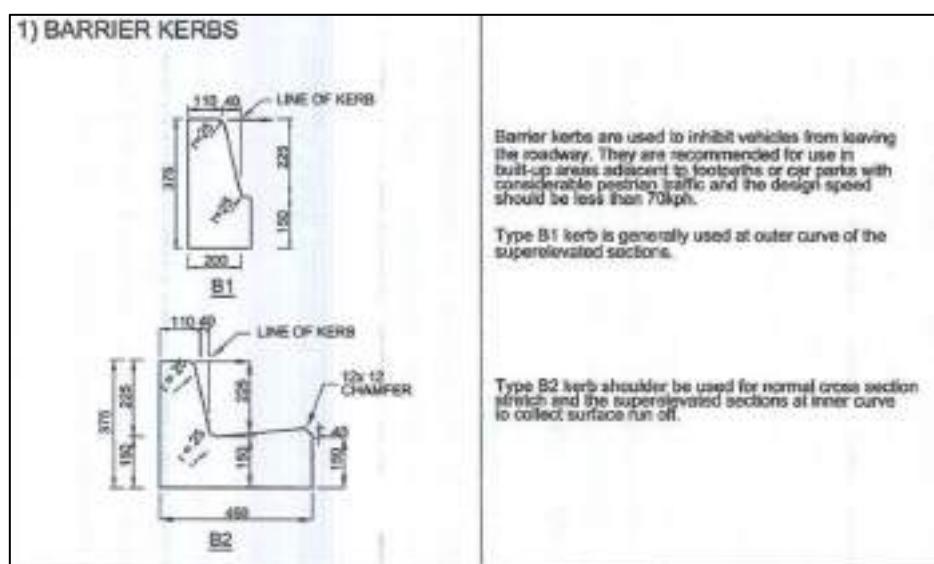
Road Barrier Kerb Details (Extracted from Figure 5.3a in ATJ 8/86 (2015))
